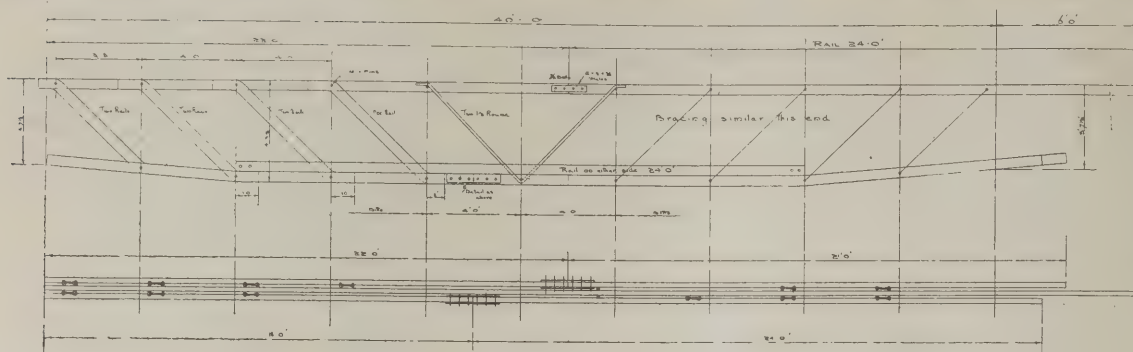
COALING 'PIER, DAGENHAM DOCK: DETAIL OF LONGITUDINAL GIRDERS,
